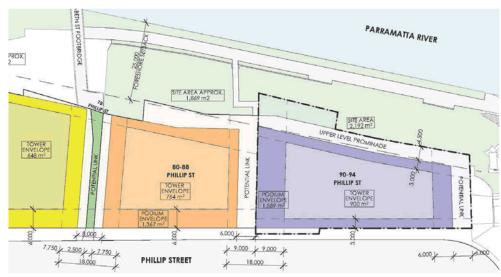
Proposed Development Site Plan (Source: PTI Architects)
